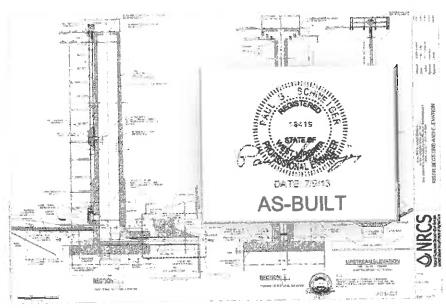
New Creek Site 14 Sample As-built Drawings. Paul Schweiger, a WV Professional Engineer and our proposed Project Manager, stamped the as-built drawings for NRCS WV's New Creek Site 14 Dam project.
